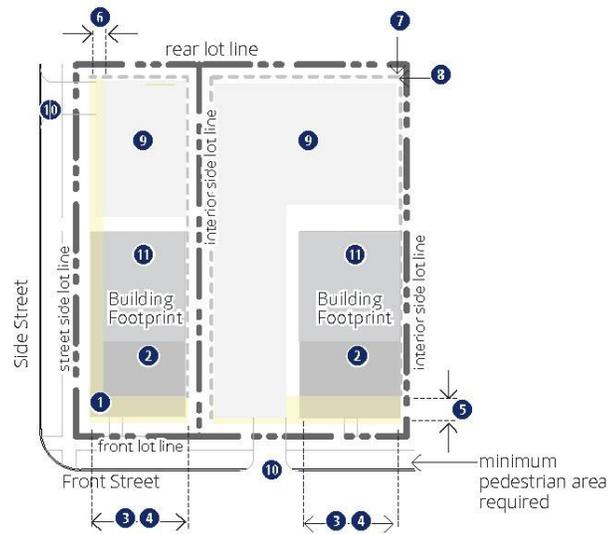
(4). NMU district diagrammatic plans and elevations.
